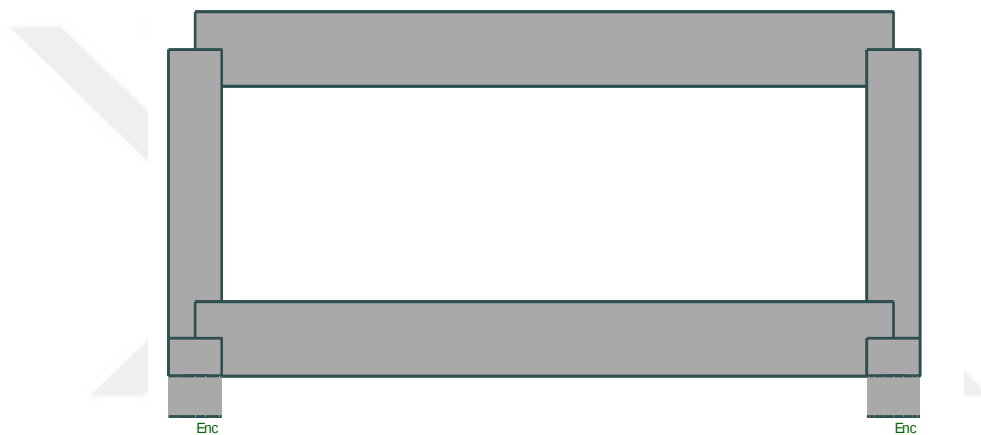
One-storey RC structure with rubber bearing (prototype)
